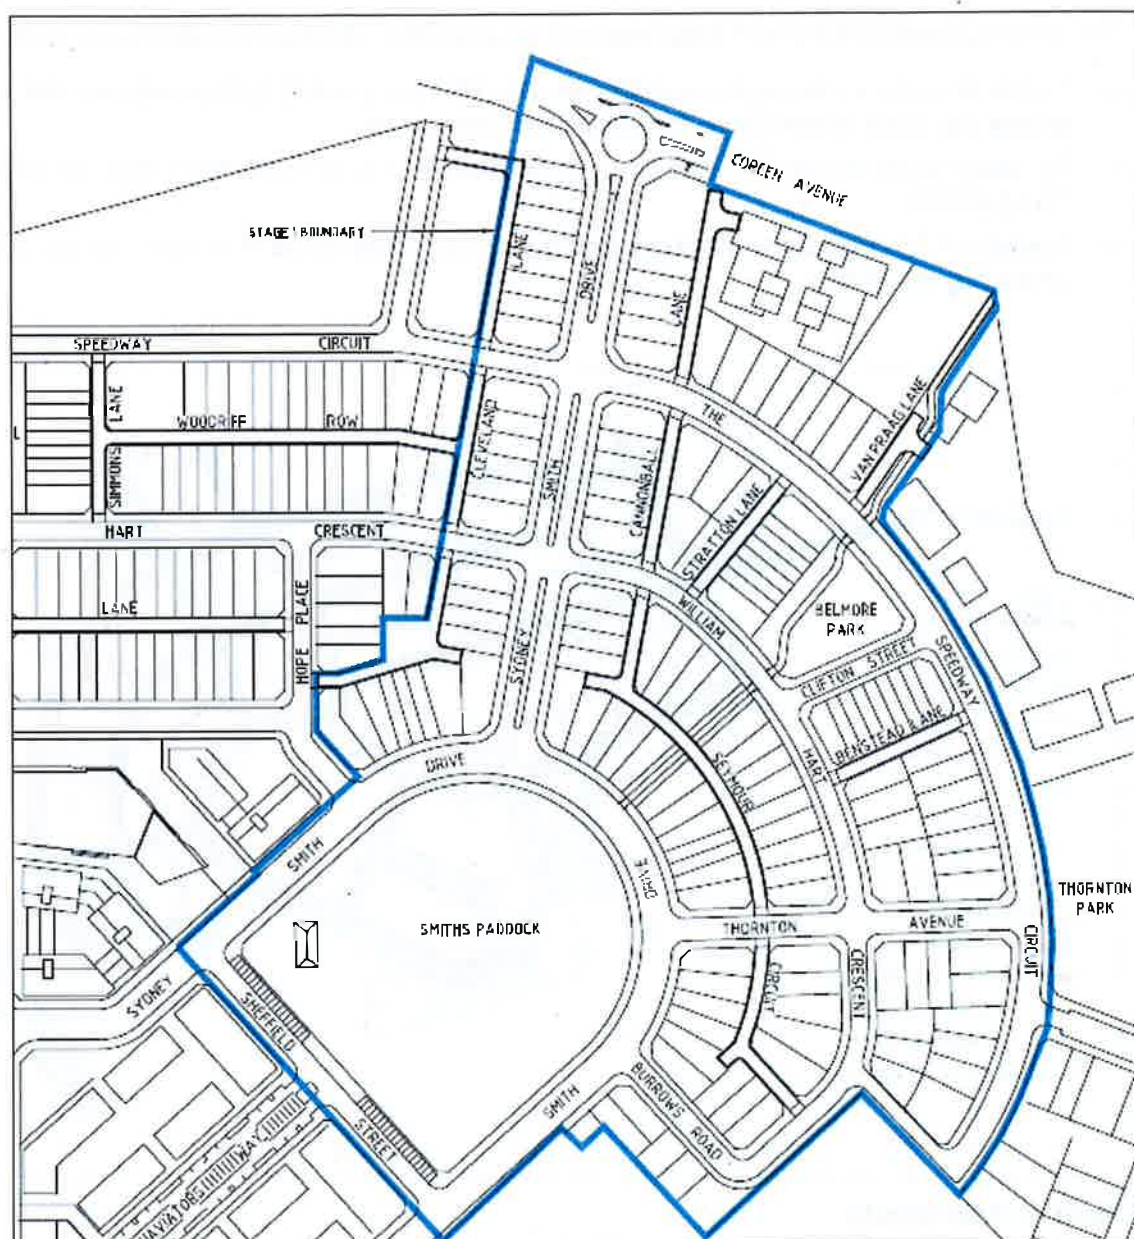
Roads to be constructed in Stage 1 (Stage 1 boundary shown in blue)
